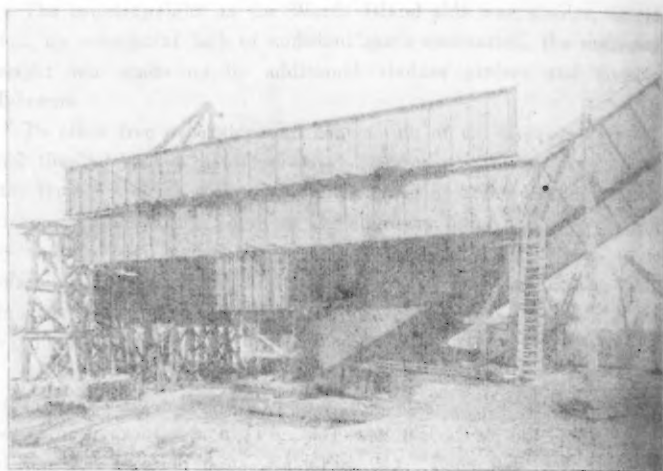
LONG ISLAND BAY, NEW YORK, CONSTRUCTION OF THE HELL GATE BRIDGE.
